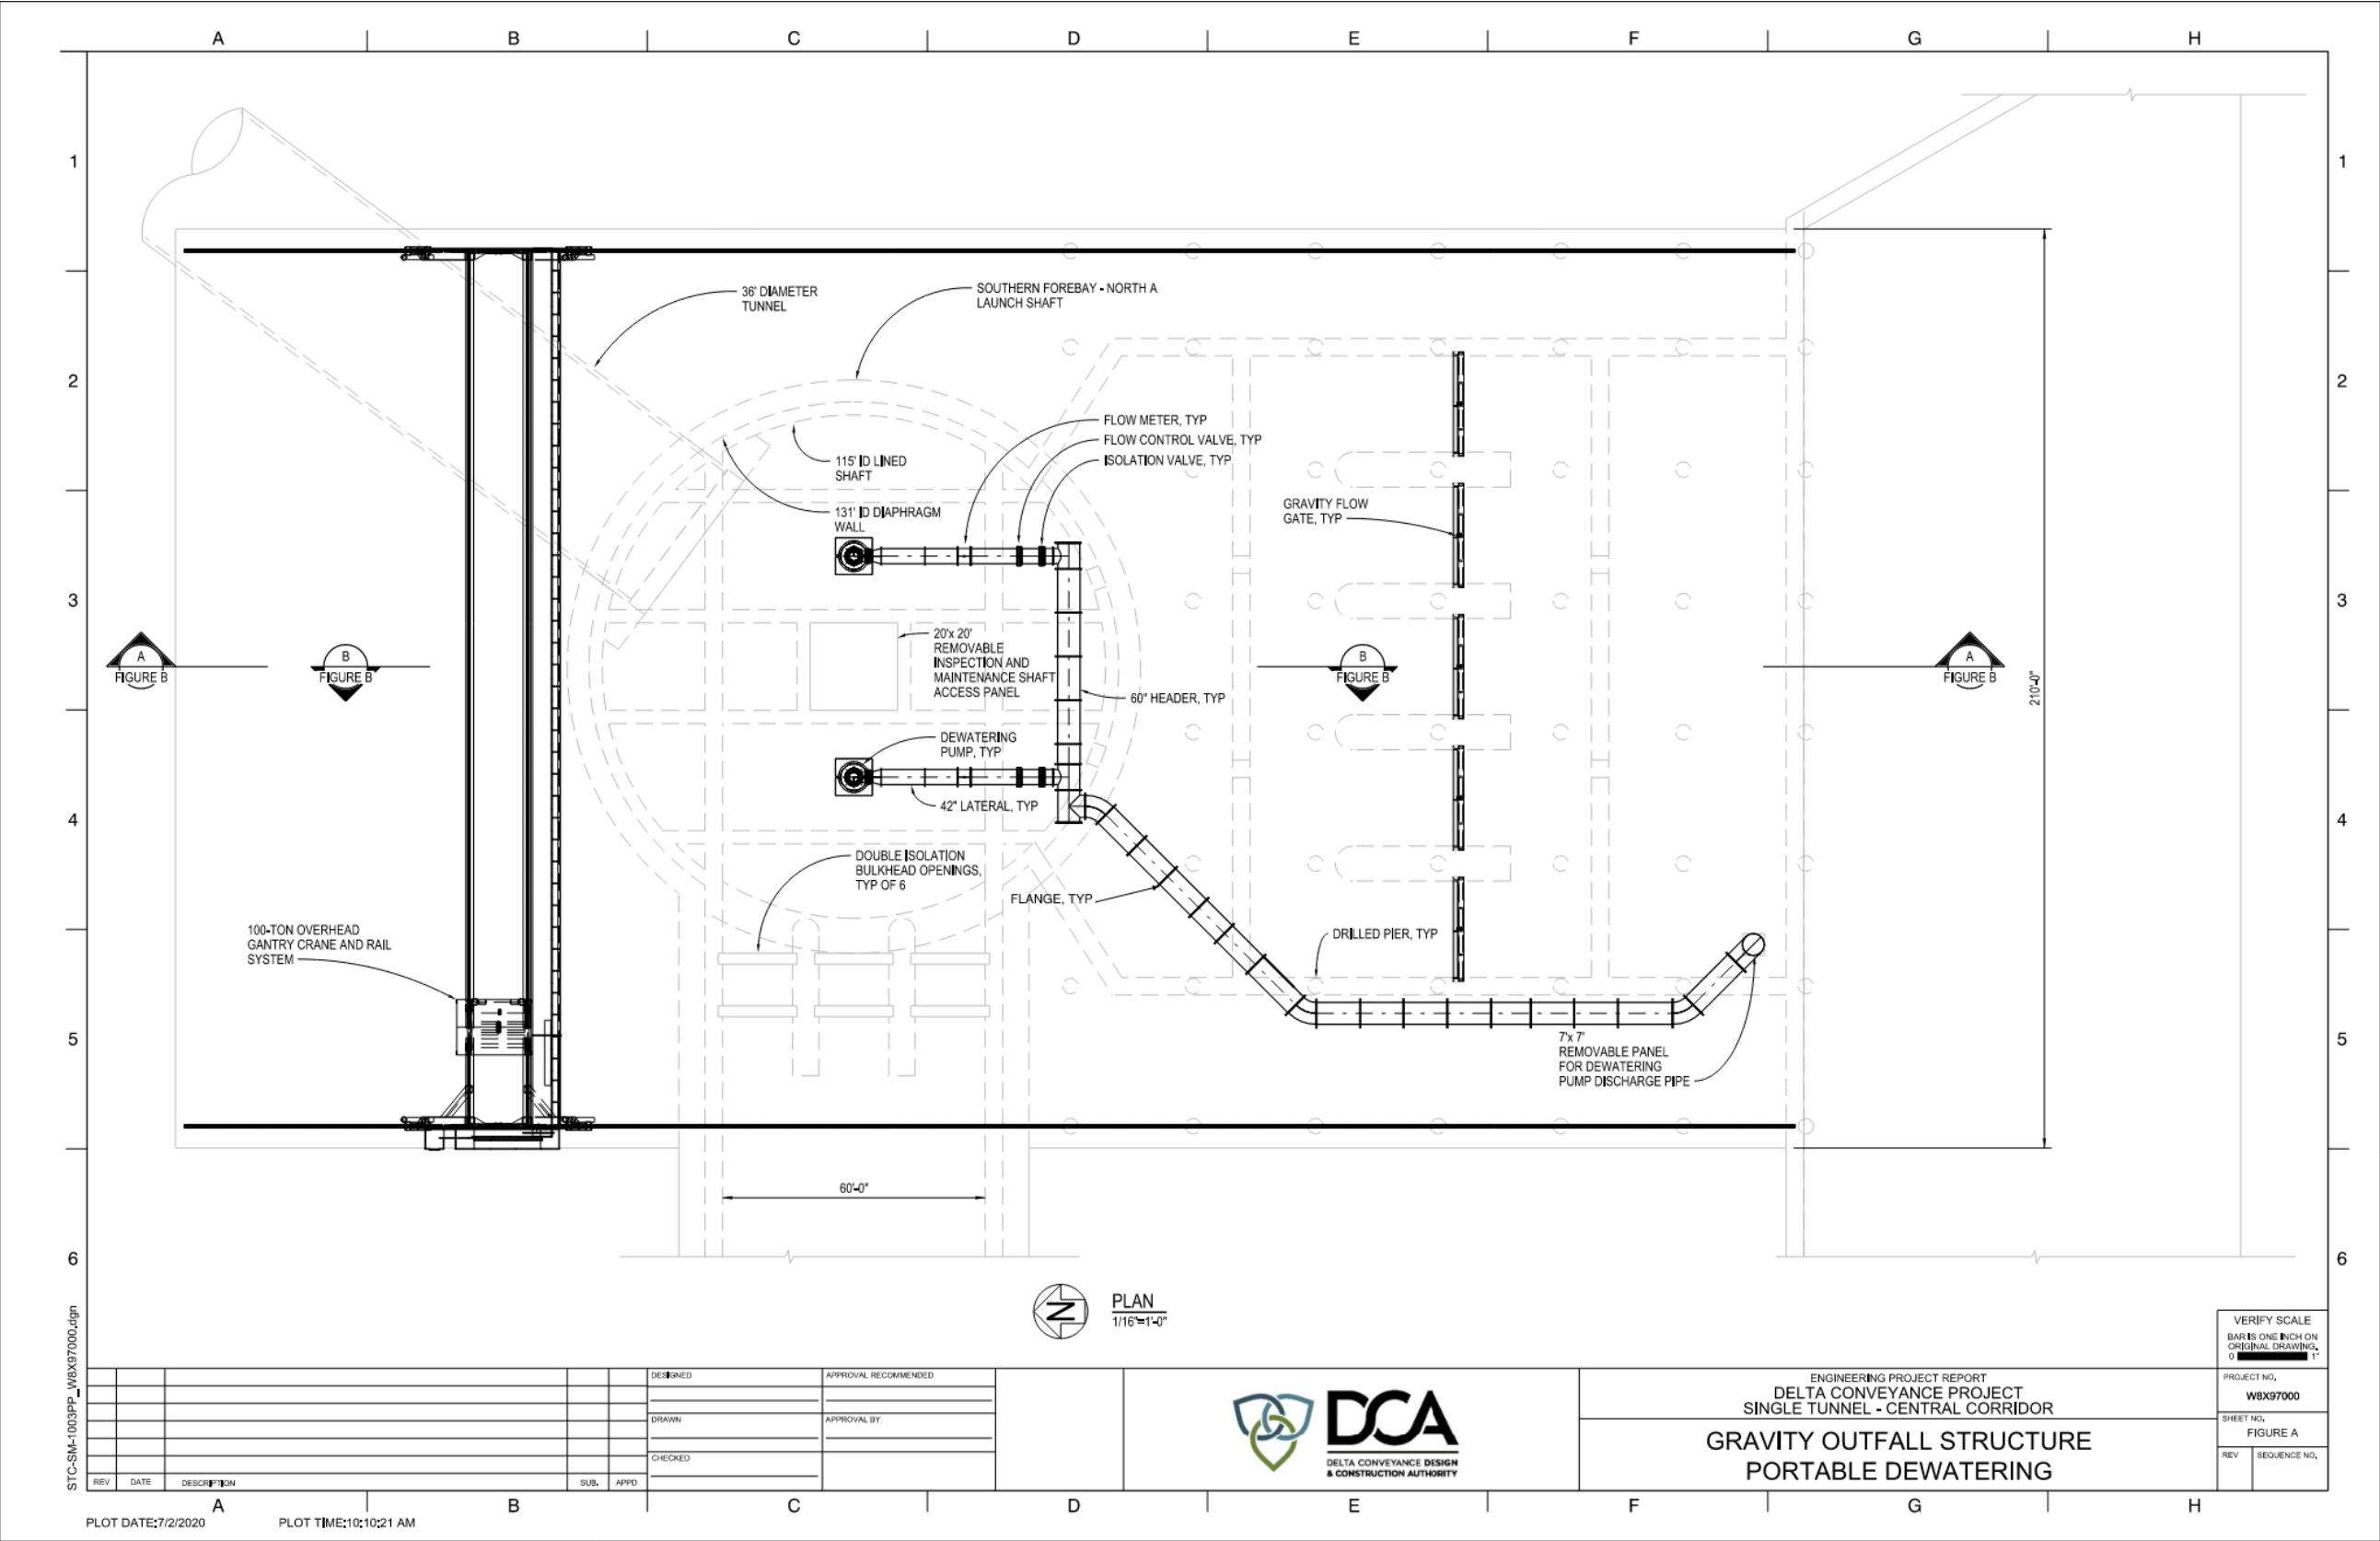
Portable Dewatering Pumping Plant Layout (Plan)
